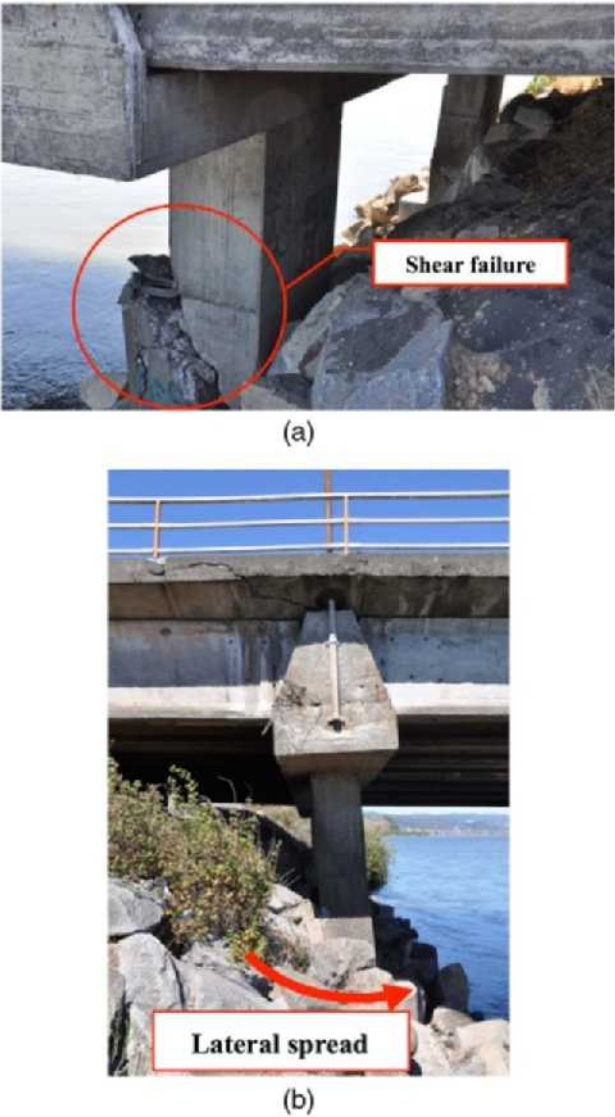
Juan Pablo II Bridge northeast approach: (a) Column shear failure, looking west, S36.816233° W73.084144°; and (b) rotation and lateral displacement of bridge bent, looking east, S36.816233° W73.084144°.
